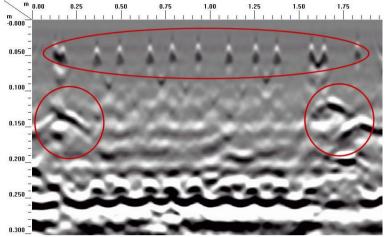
GPR scan on the external face of the downstream beam (positions expressed in m).
